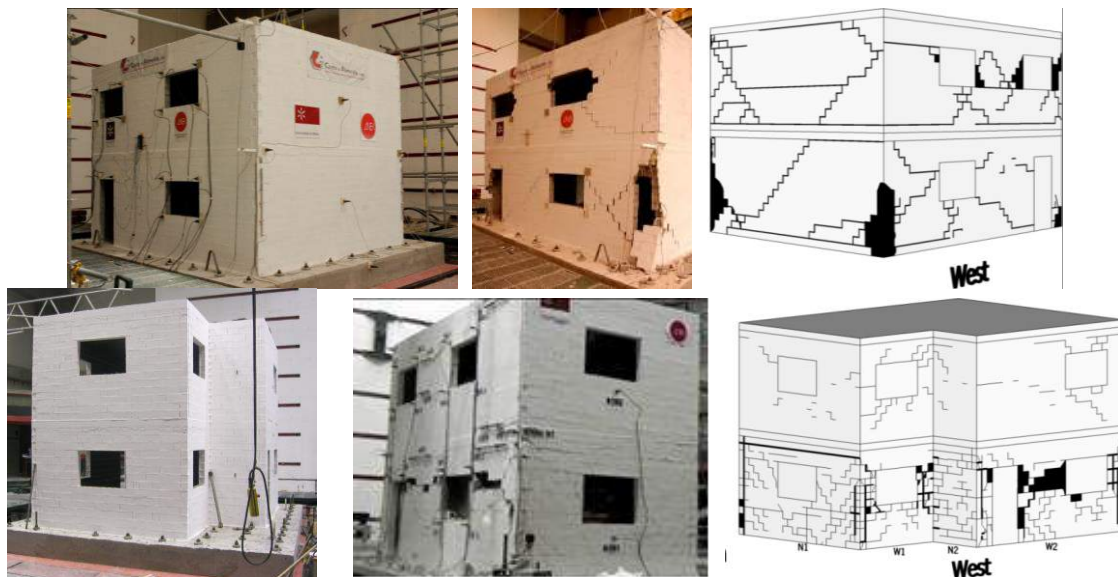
Shaking table testing on concrete block masonry buildings with distinct layout in plan.
